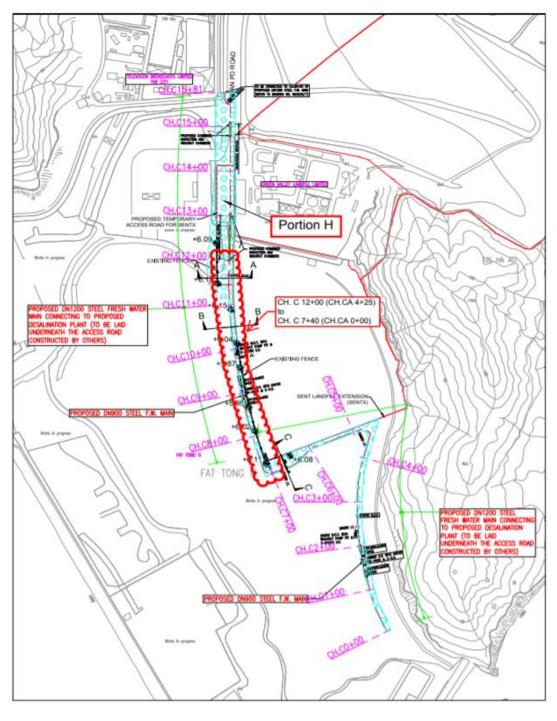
Location Plan for Portion H– CH.C 7+40~CH.C 12+00 (CH.CA 0+00 ~ CH.CA4+25)
